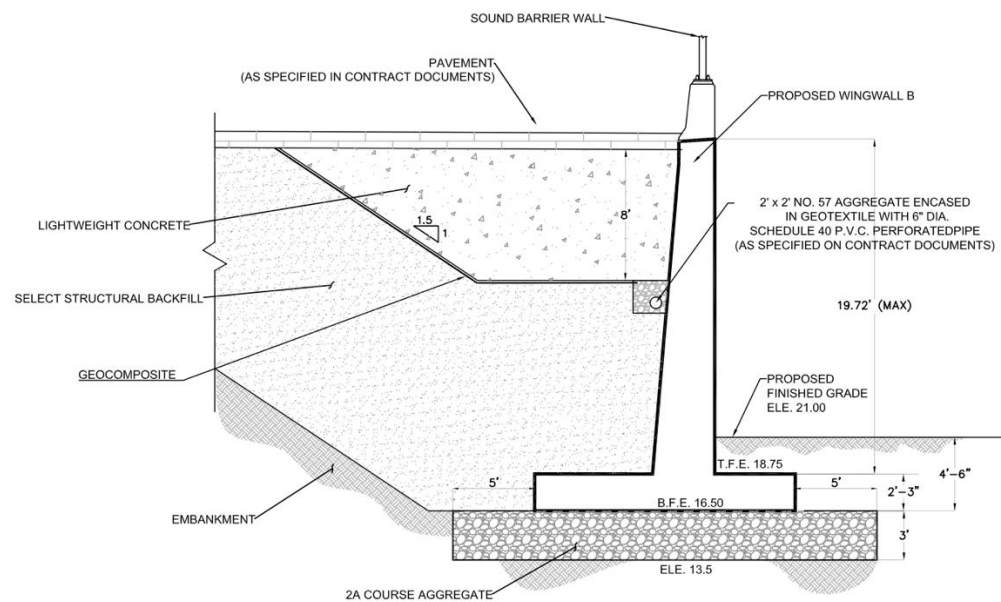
Typical cross section for Wingwall B (0095 Over Shackamaxon Street, S-26064).
